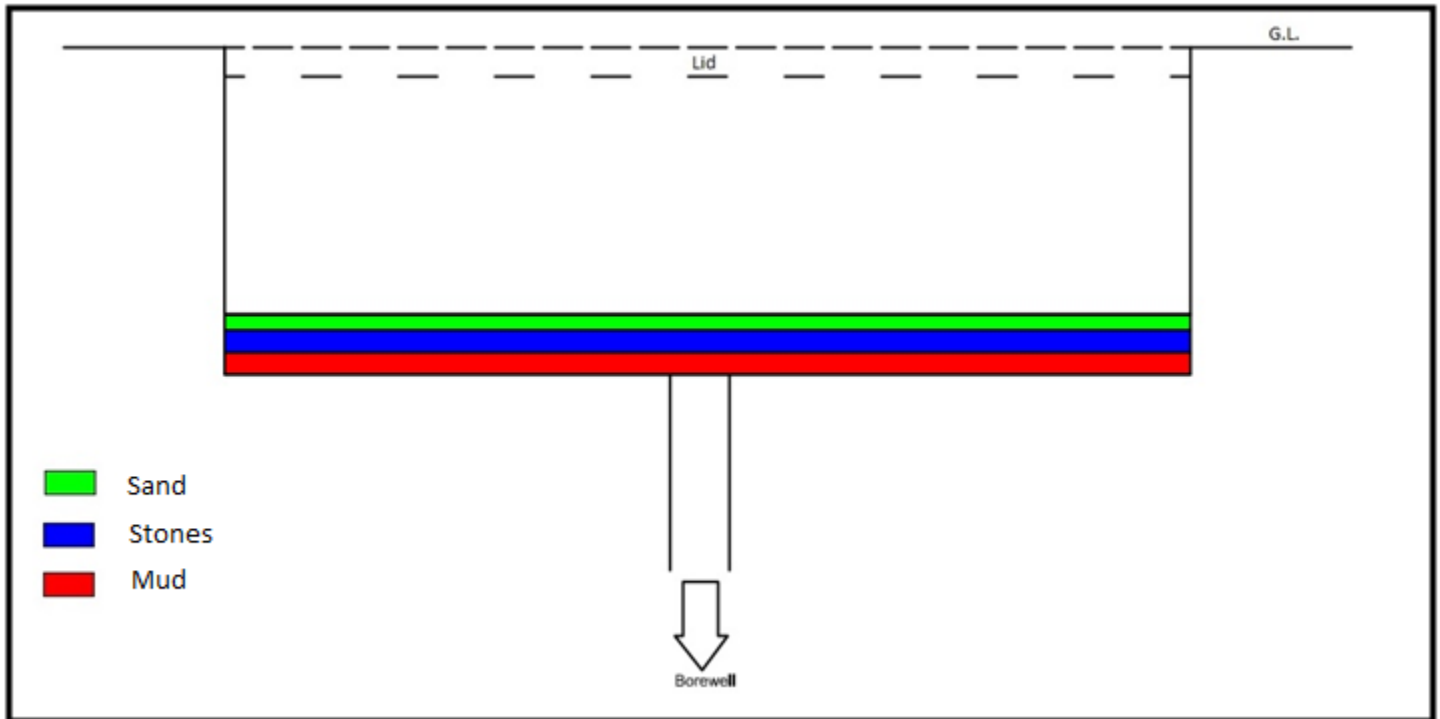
Typical layout of the underground water tank for RH (boring method)
